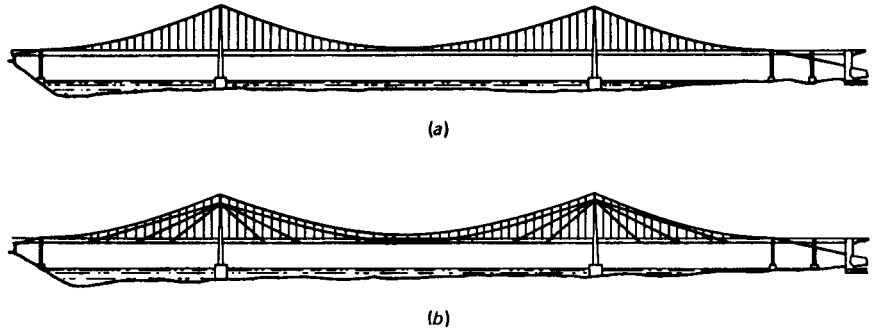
The Salazar Bridge. (a) elevation of the bridge in 1993; (b) elevation of future bridge. (Reprinted with permission from W. Podolny, Jr., and J. B. Scalzi, "Construction and Design of Cable-Stayed Bridges," John Wiley & Sons, Inc., New York.)
